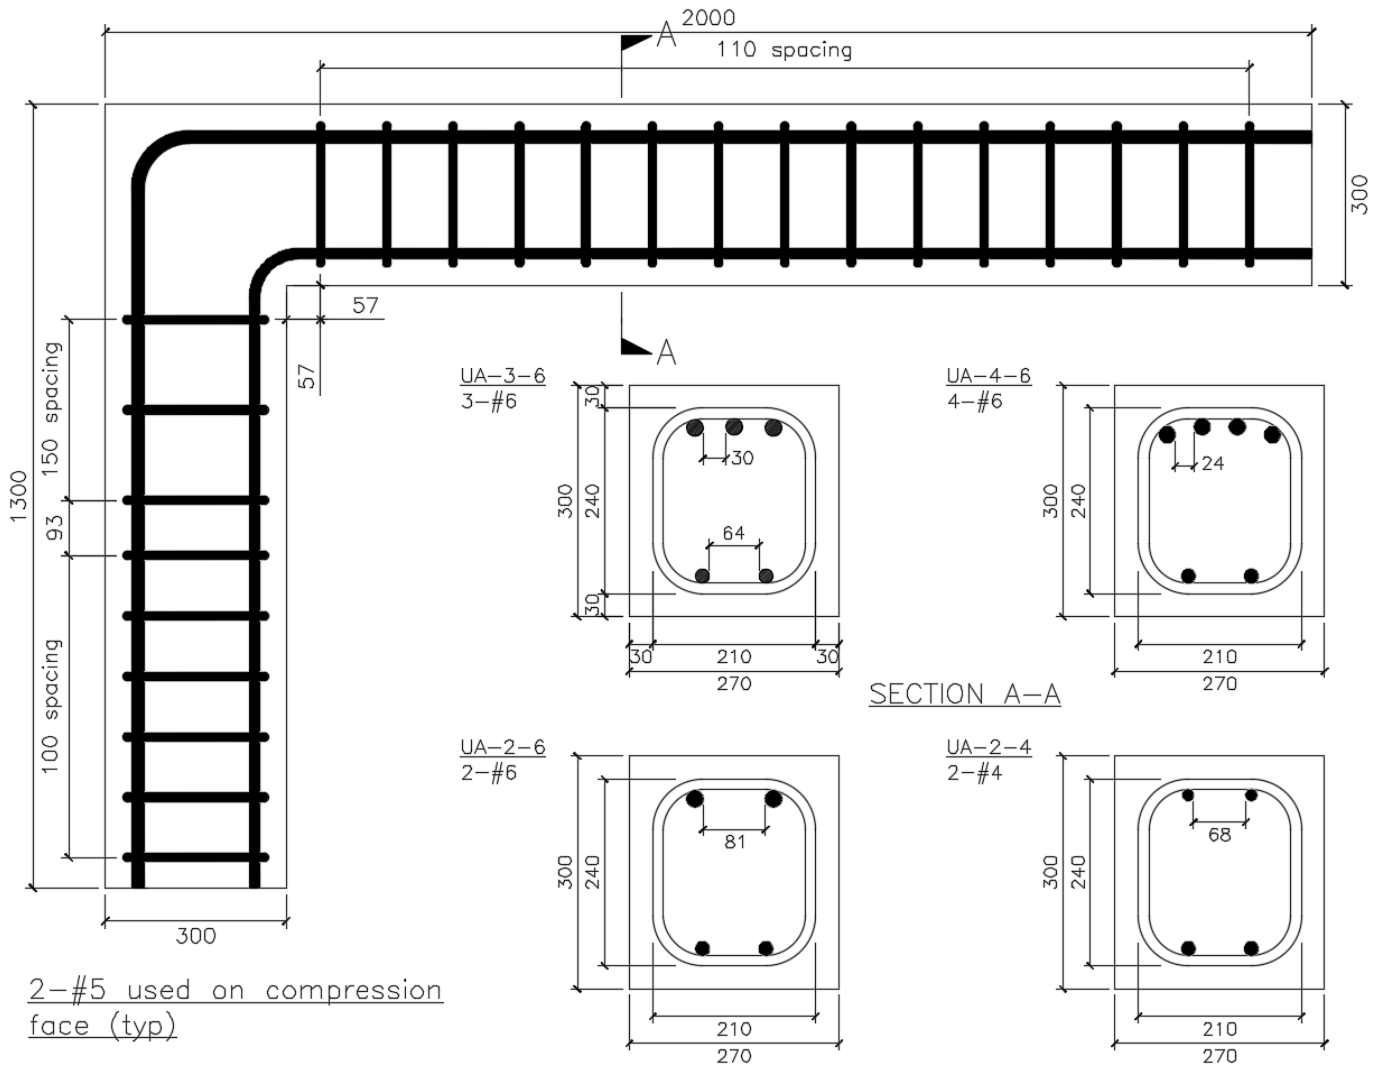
Reinforcement Details for Unconfined Joint Series (Type A)
